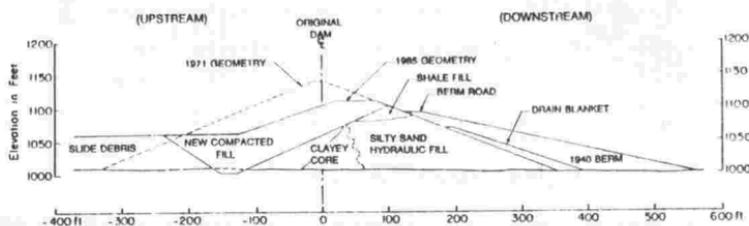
Current Configuration of Reconstructed Lower San Fernando Dam
